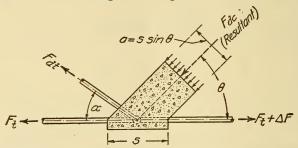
Stresses at junction of web reinforcement with longitudinal reinforcement
